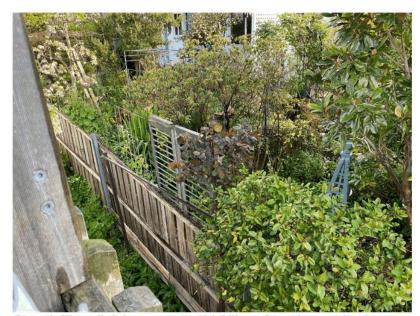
The adjoining property (21 Allison Street) opposite the existing proposed deck.
